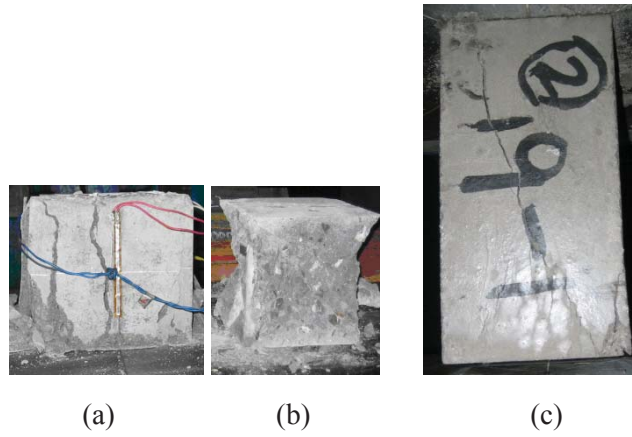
Typical failure mode of the concrete specimens: (a) (b) cubic specimens (c) prismoid specimens
